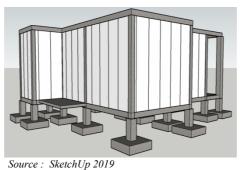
3D Module Rear and Left Side Sandwich Panel Wall
